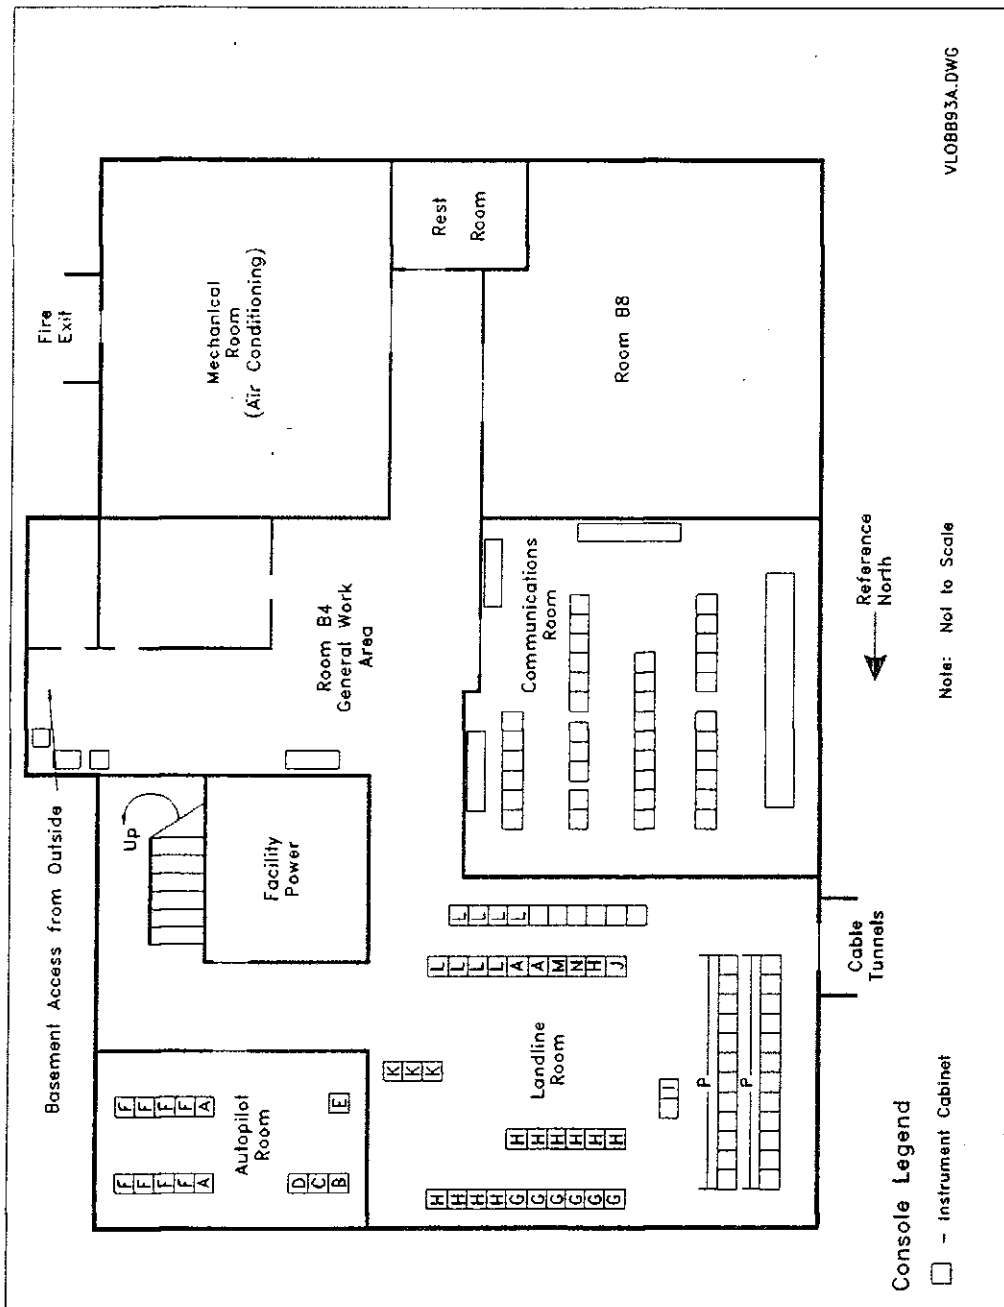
Plan view of basement level of the Launch Operations Building (Bldg. 763)
